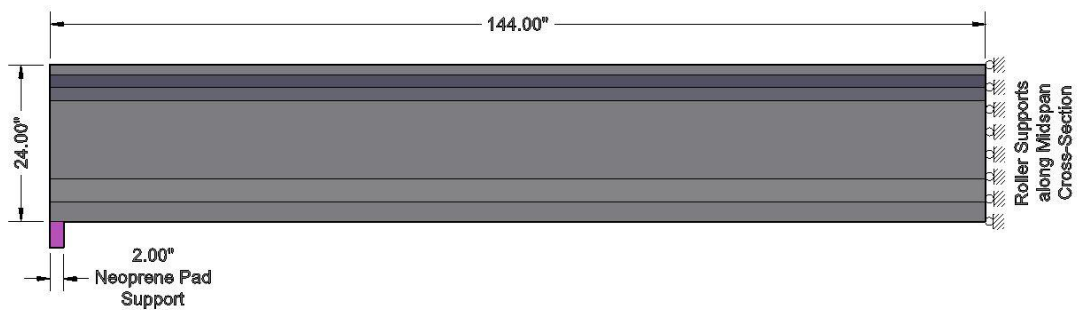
12-foot Long Beam Model Profile with 2-inch Support (FEA Beam at Release and at Testing/Loading)
